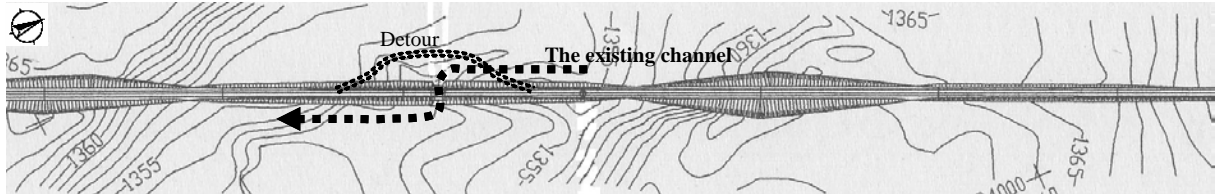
Plan of Khujirt Bridge Site and its Surroundings
